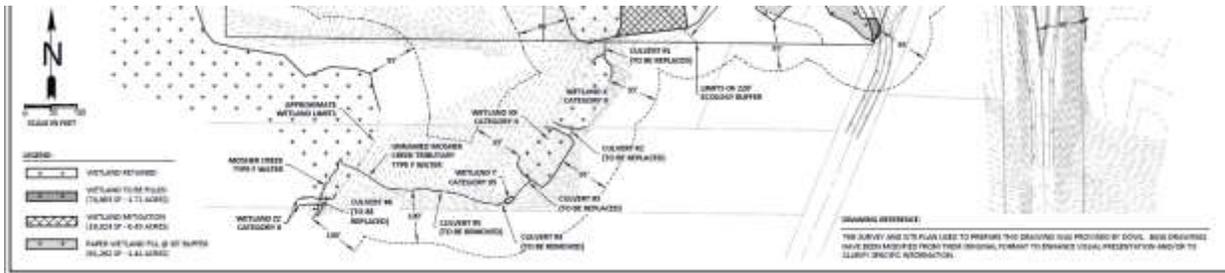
Enlargement of Mitigation Plan to Show Off-Site Stream Culvert Replacement
